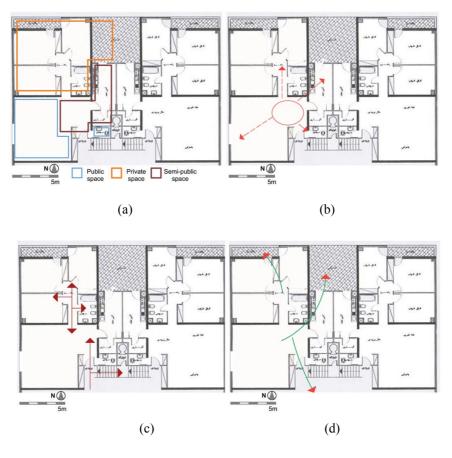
(a) Private parts is separated from public area (b) The central hall provides access into different part of the unit. (c) Rooms are connected with the corridors and central hall. (d) private rooms and kitchen have opening into the balconies
